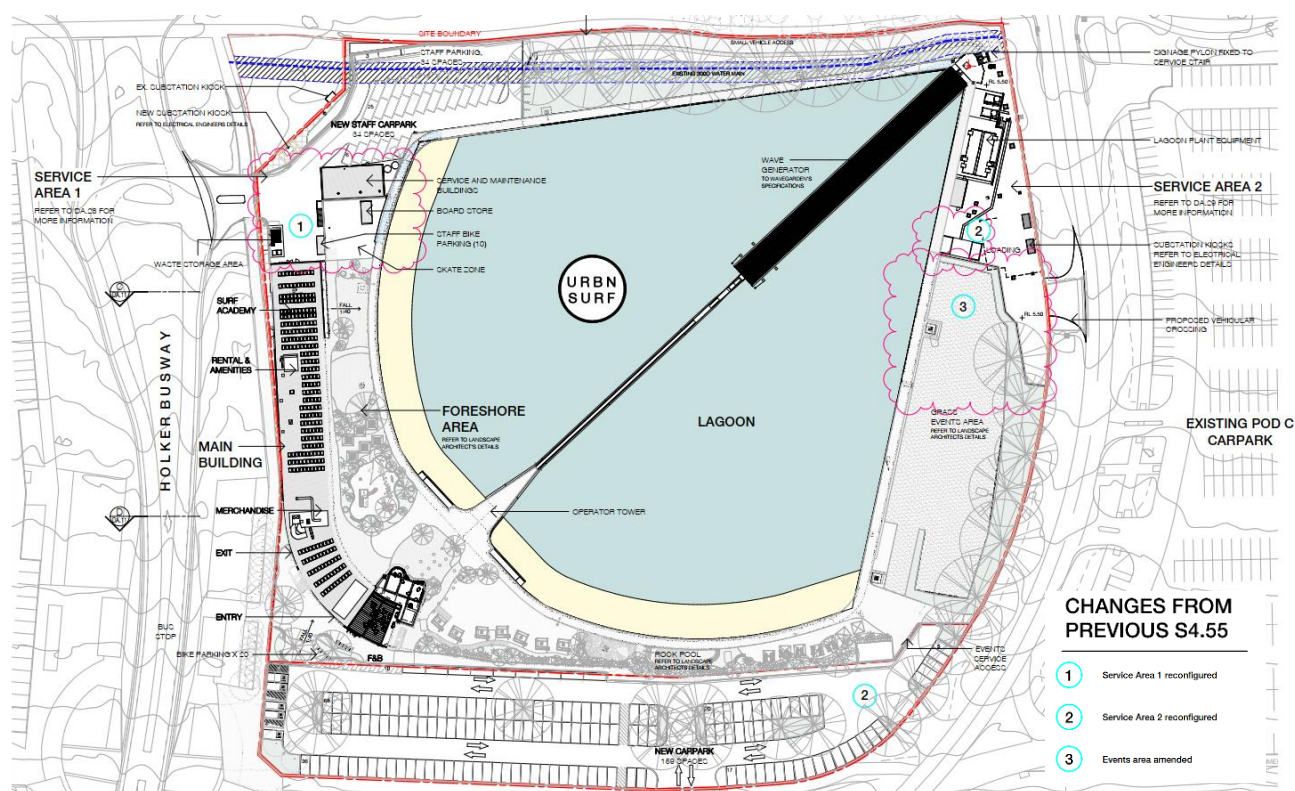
Excerpt from CHC Architectural Drawings Package Proposed Site Plan
